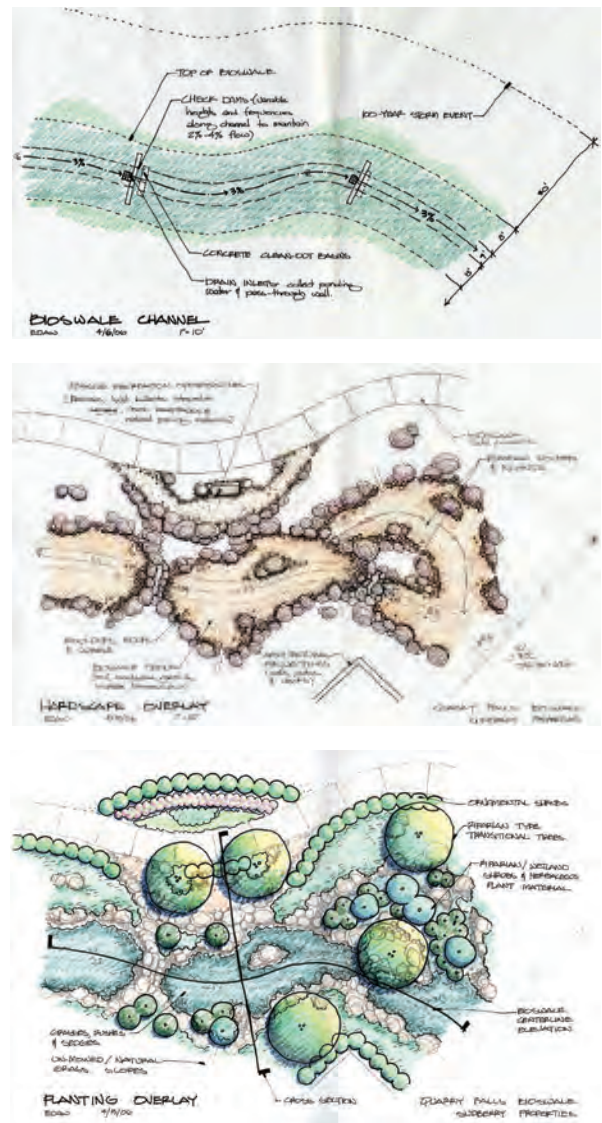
Typical Planning Elements of Vegetated Swale Layouts
